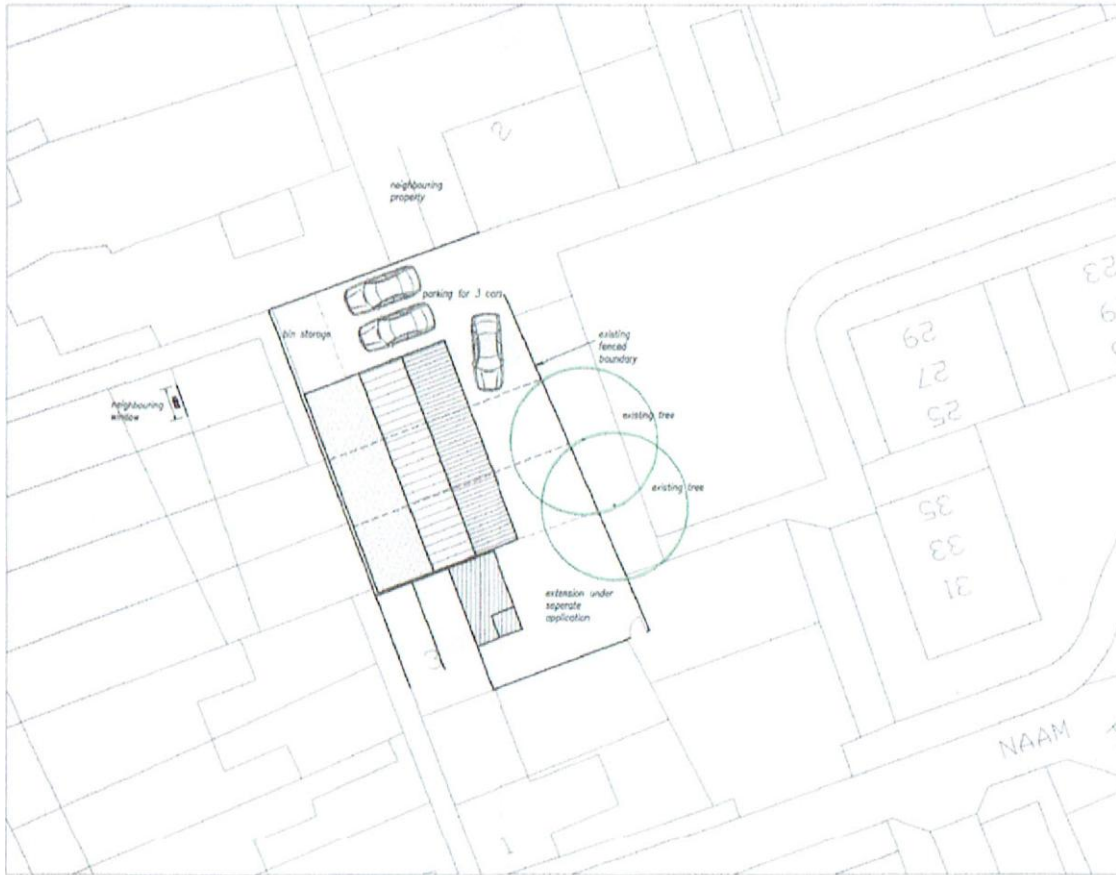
Block plan showing the site location and proposed layout of the development site at an original scale of 1:200, (not to scale), (extract from Architects plan).
